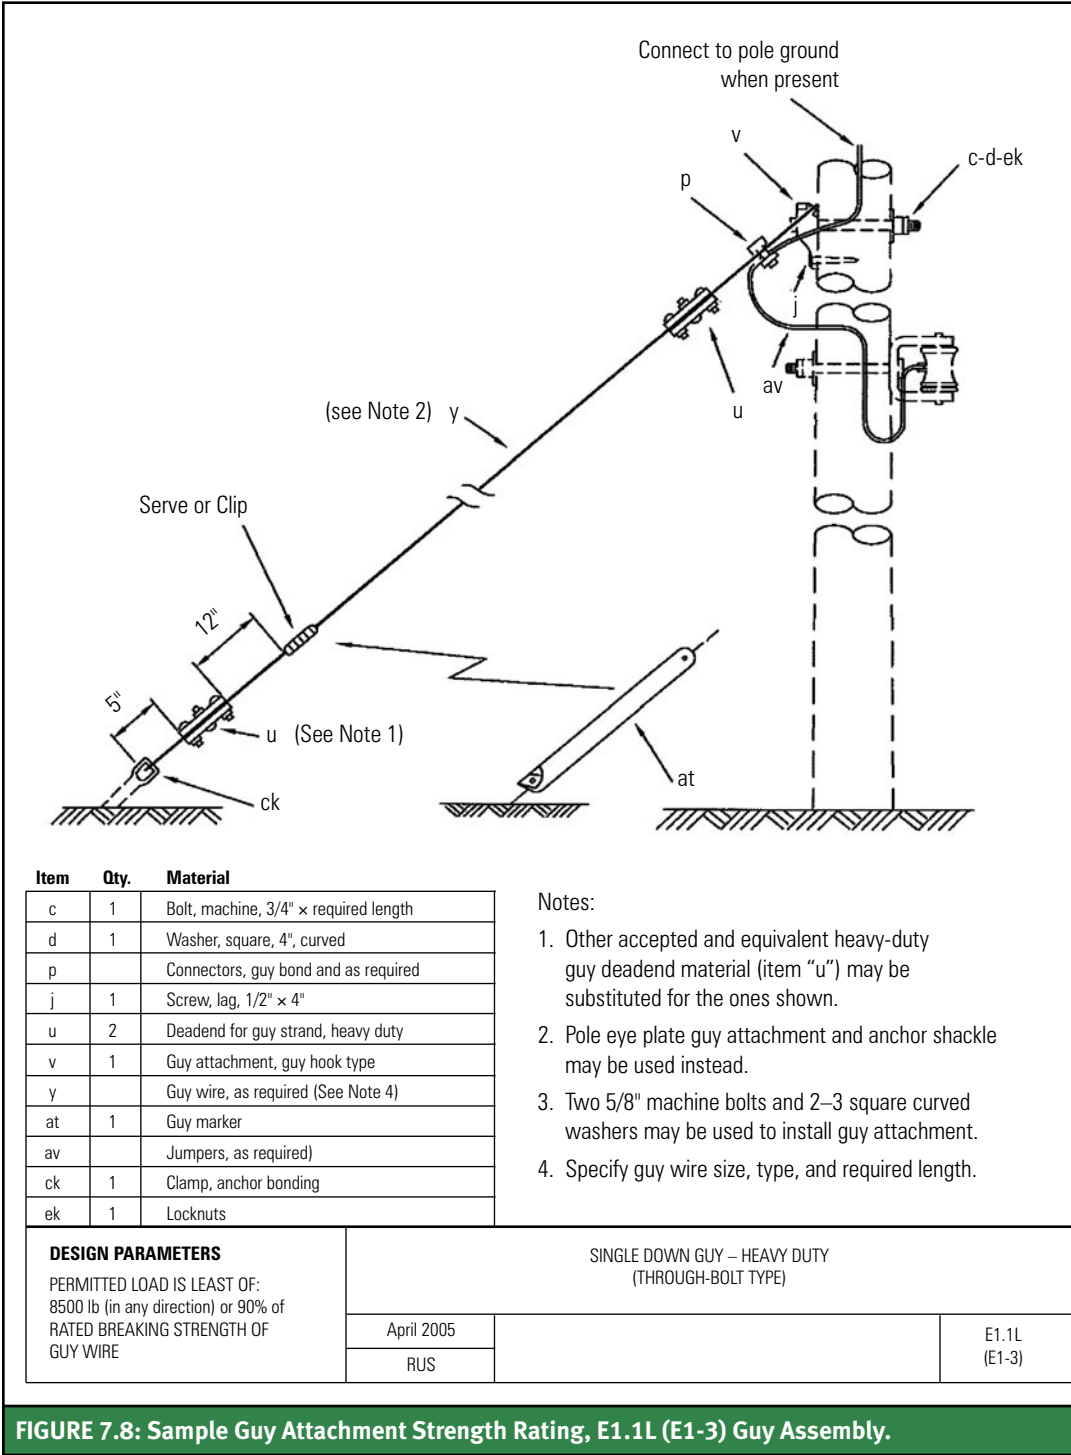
Sample Guy Attachment Strength Rating, E1.1L (E1-3) Guy Assembly.
